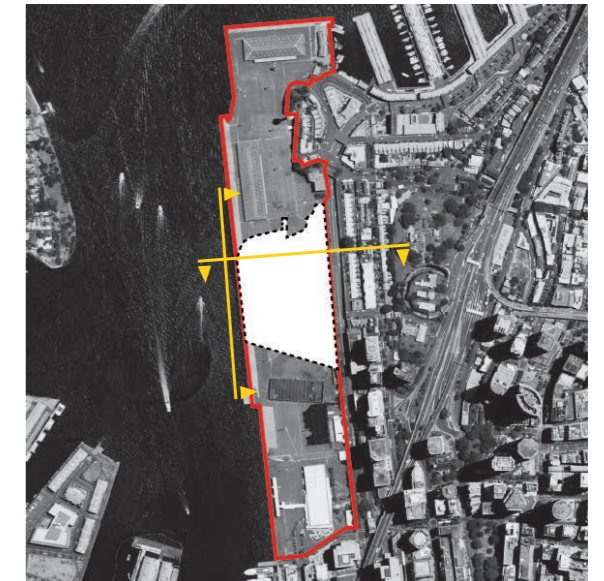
Plan showing MOD 9 within Central Barangaroo (Source: AECOM modified HASSELL diagram (November 2020))
